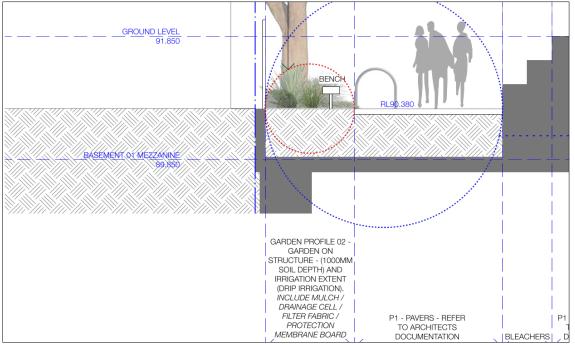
Extract of Section 02 from Details and Sections (Dwg. No. LA LP 112 / 01) from Appendix F Landscape Plans; RLs indicate a soil depth less than 530mm.
